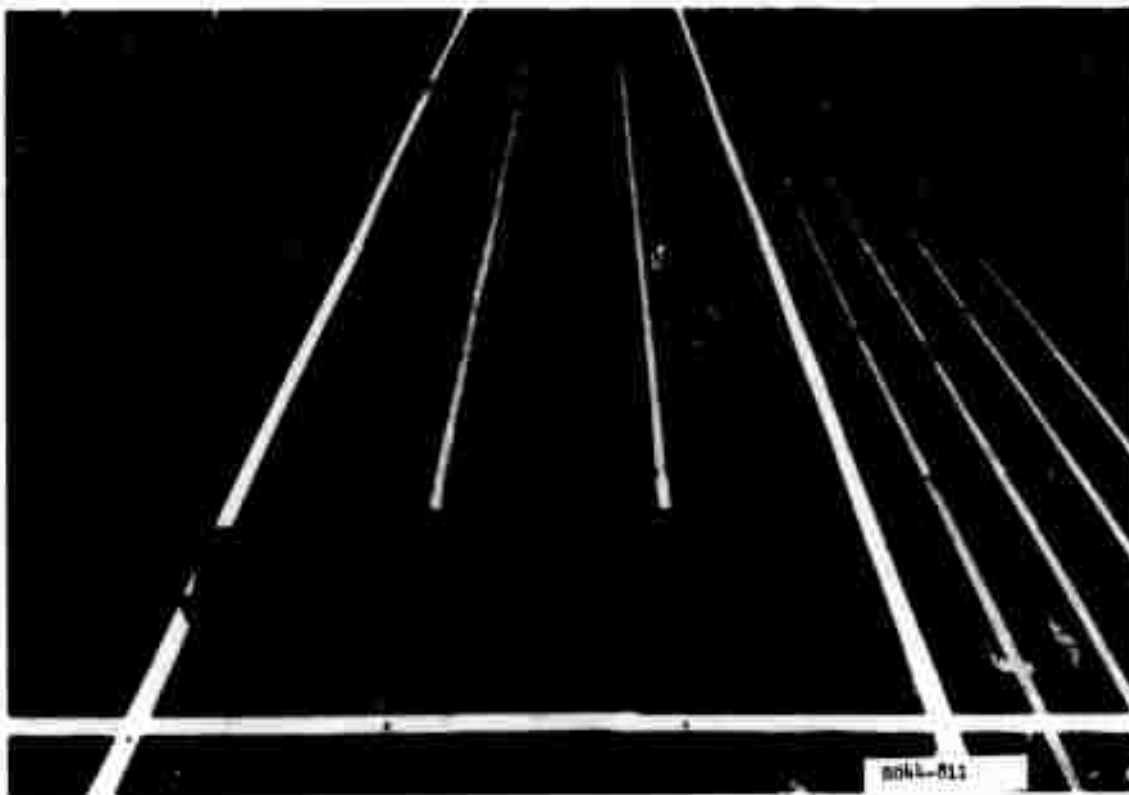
Item 4, lane 1, flexible pavement test section, prior to traffic
